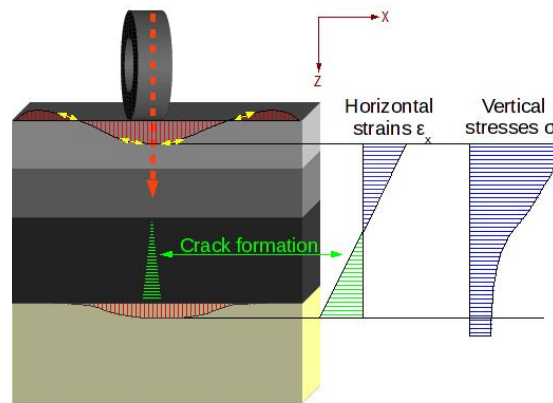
Repartition of stress and strains in a road structure under traffic loading
